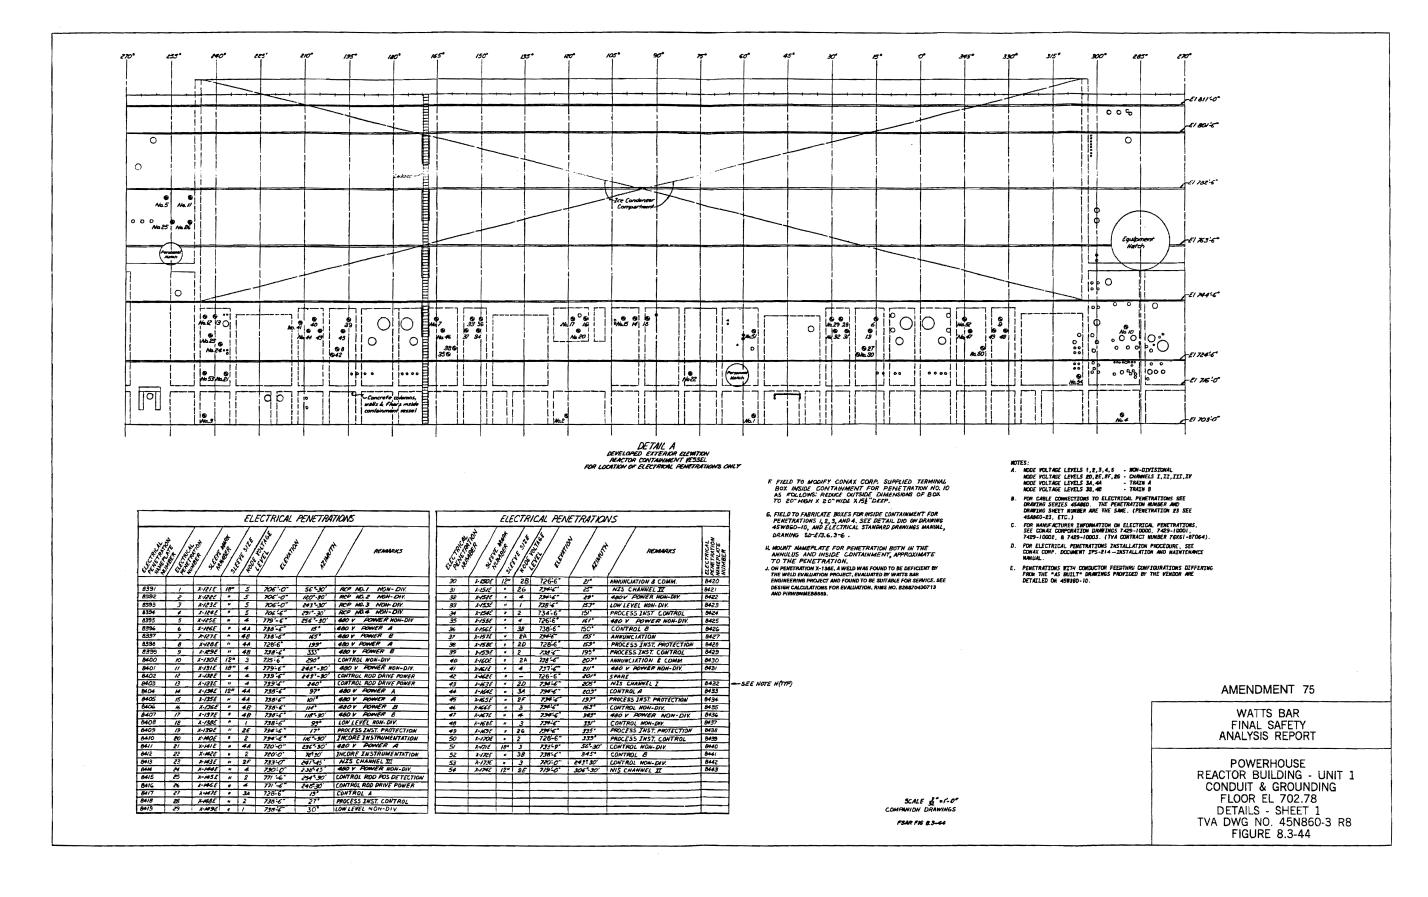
owerhouse Reactor Building -Unit 1 Conduit and Grounding Floor EL 702.78 Details -Sheet 1
